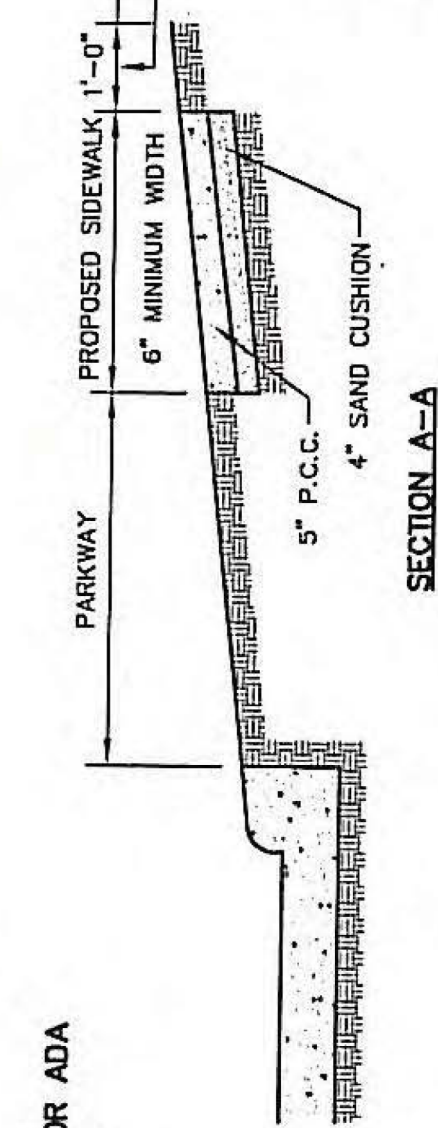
DETAILS OF PORTLAND CEMENT CONCRETE SIDEWALK CONSTRUCTION
